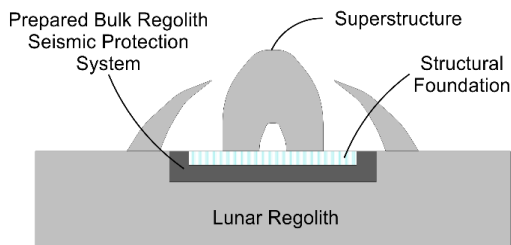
Example of Bulk Regolith Dampening Seismic Protection System
